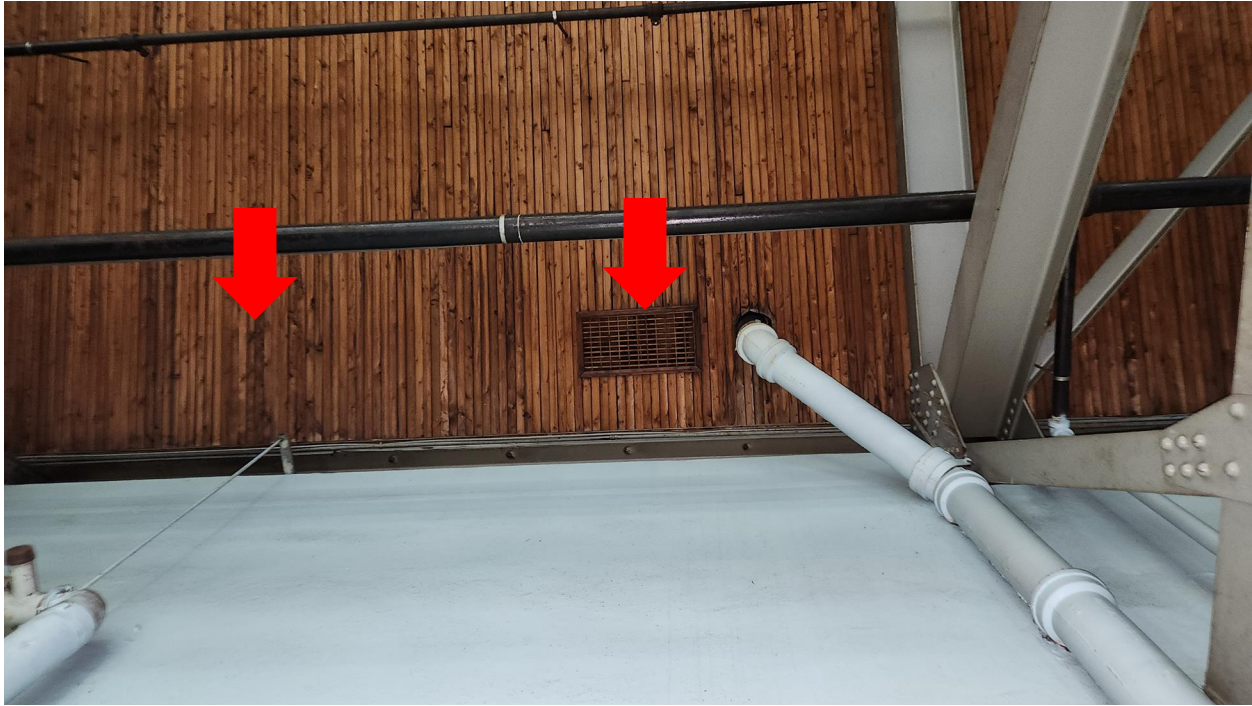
Water stains and typical opening through NLT deck (High Roof c.1951).
